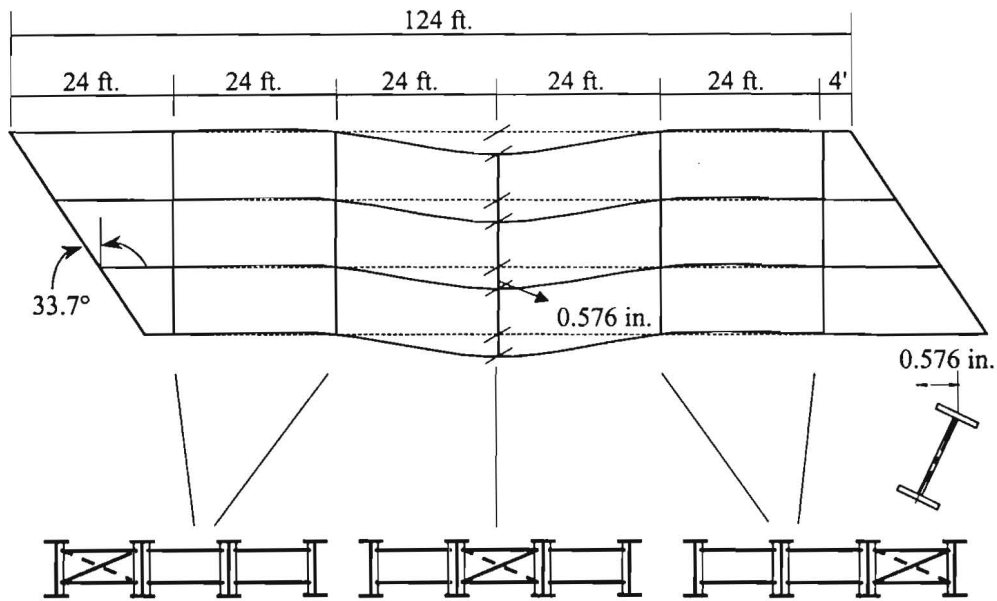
Imperfections for the Four-Girder Bridge with Lean-On Braces
